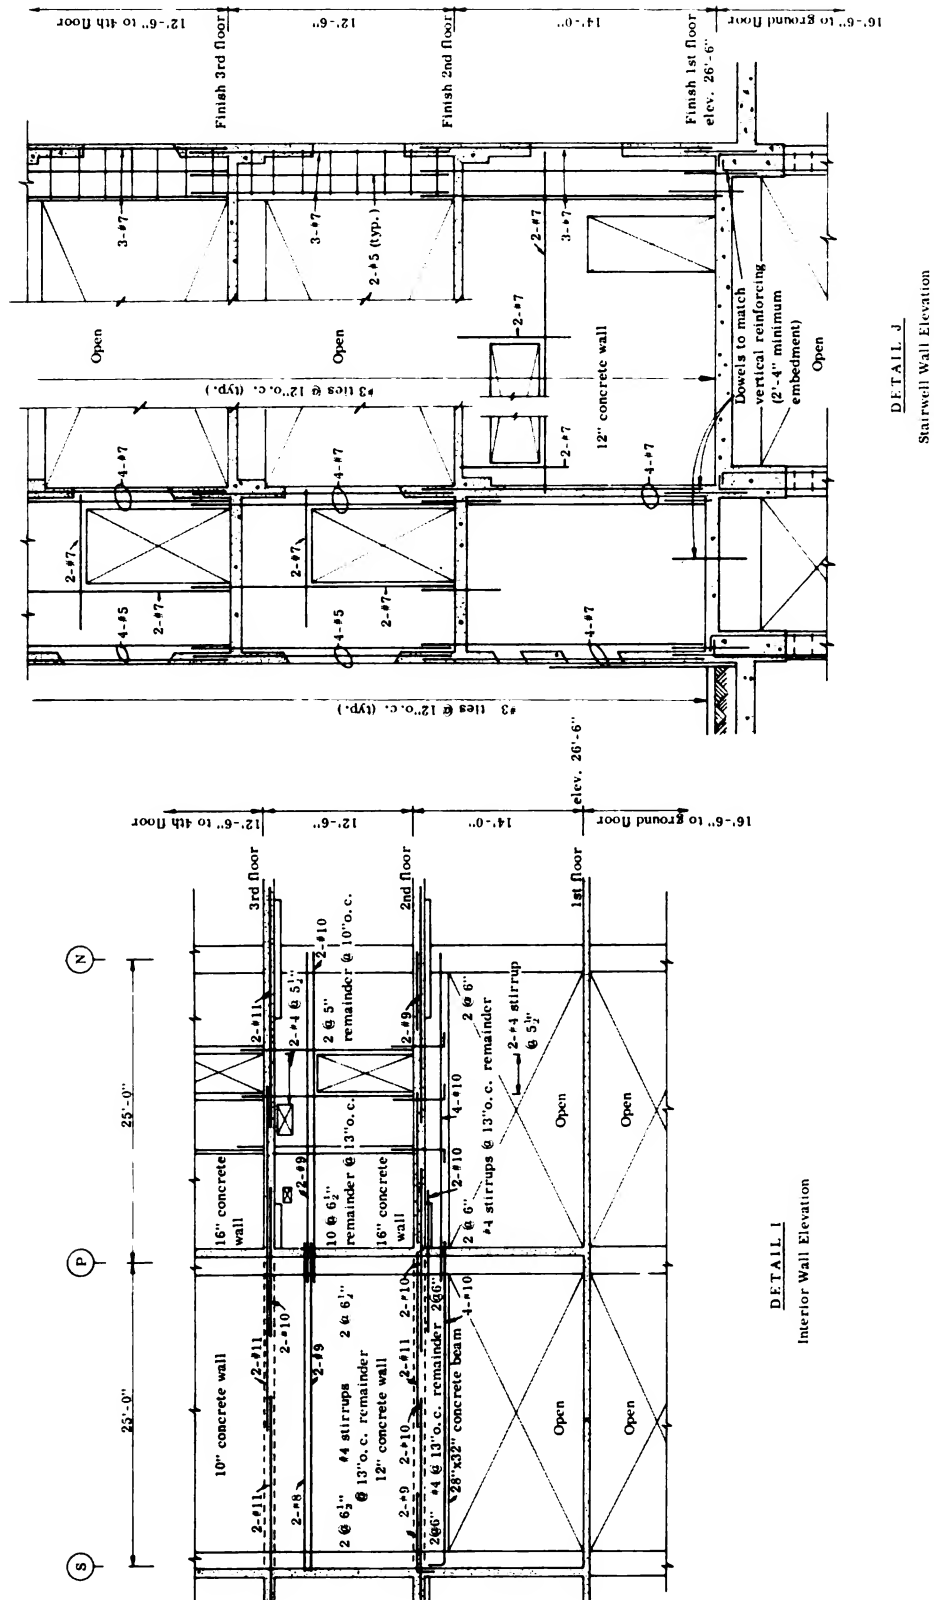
Olive View Hospital, medical treatment and care unit. Typical interior wall and stairwell wall elevation details.
